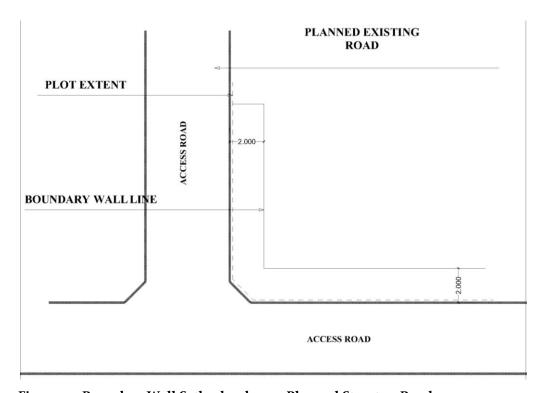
Boundary Wall Setbacks along a Planned Street or Road.
